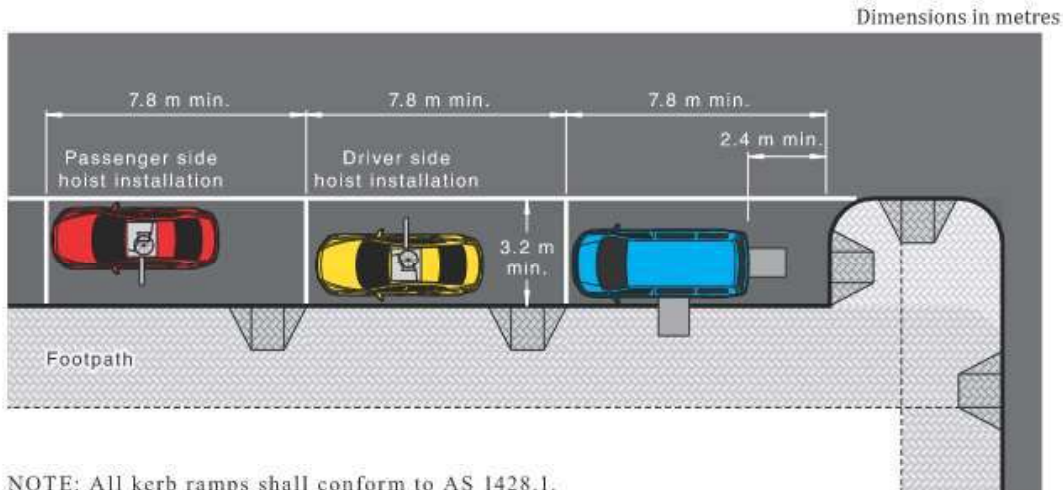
Examples of accessible parallel parking with kerb extensions
